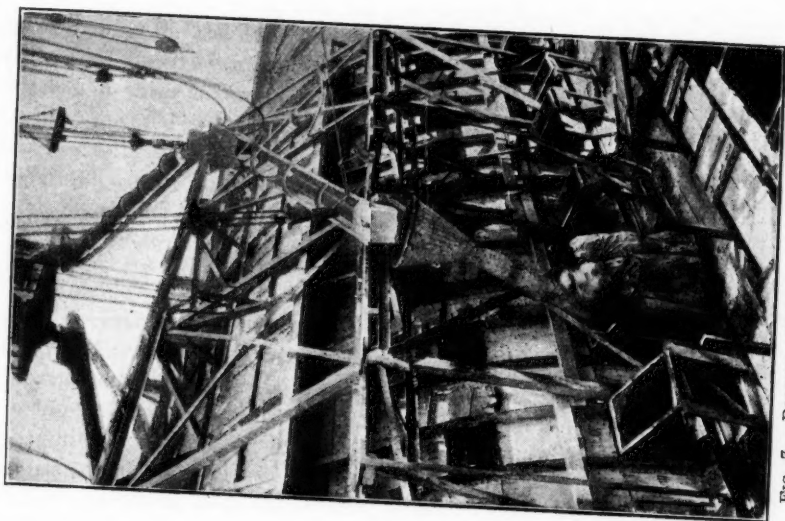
POURING CONCRETE IN CROWN SECTION.
